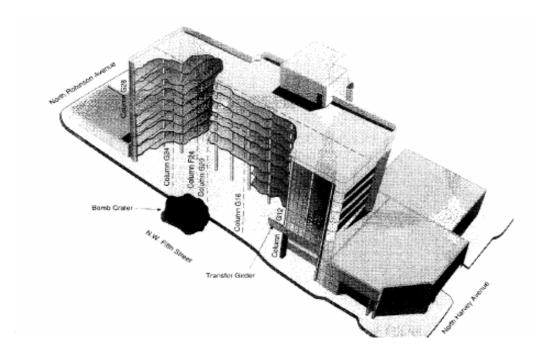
Explosive Damage to the North Side of the Murrah Building. [22]
